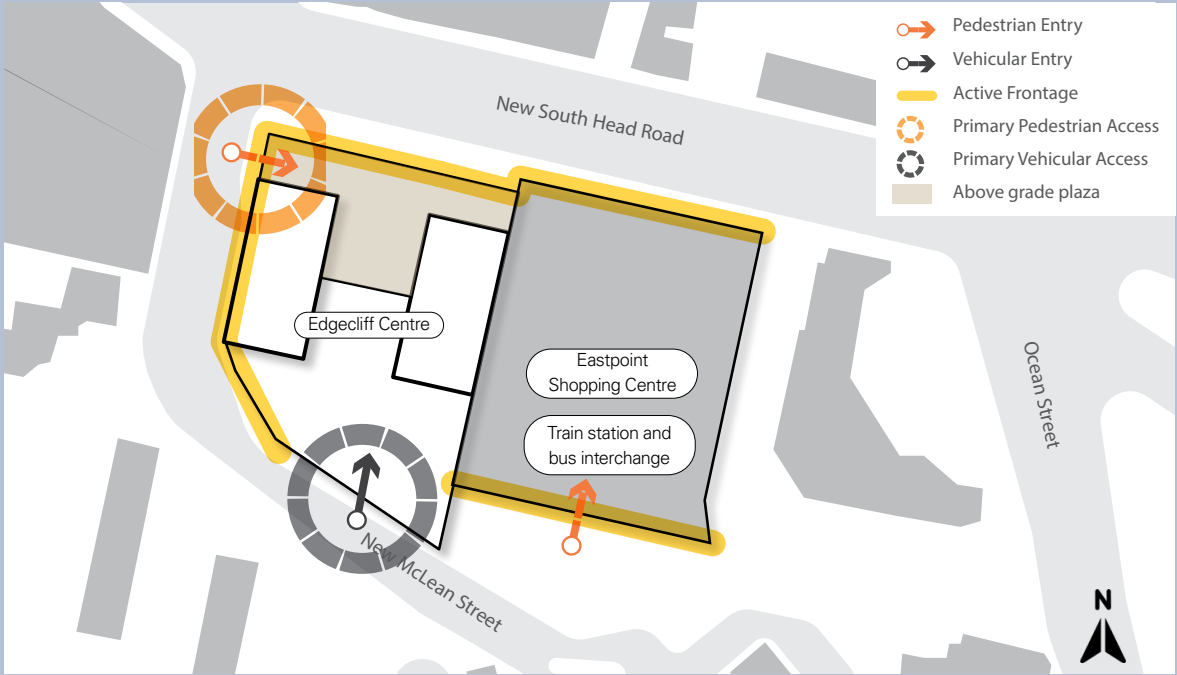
Concept plan of envisioned development at 203-233 New South Head Road(SJB 2018)
